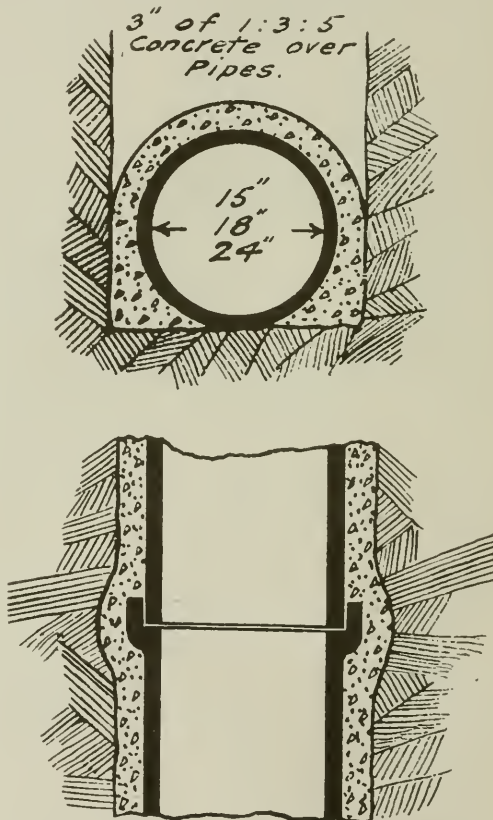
Sections Showing Method of Laying 15-in., 18-in. and 24-in. Tile Pipe
